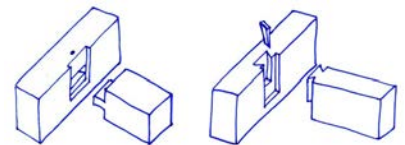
15. Orthogonal beam to beam connections for base plate, floor beams, and roof level. (left) The use of a peg (timber or metal) would give this connection some limited tension capacity. (right) The dovetail shape gives the connection tensile capacity, an important feature under reversing loads. (Note: Such joints are however rarely used. Same plane joints are usually cross halved joints which cannot open and work well in tension. Dovetail is not used. Blocking pieces are often added in same plane joints if it was not cross halved. They don't fix the tension issue but they can add more interfaces and help avoid the joint opening.)
